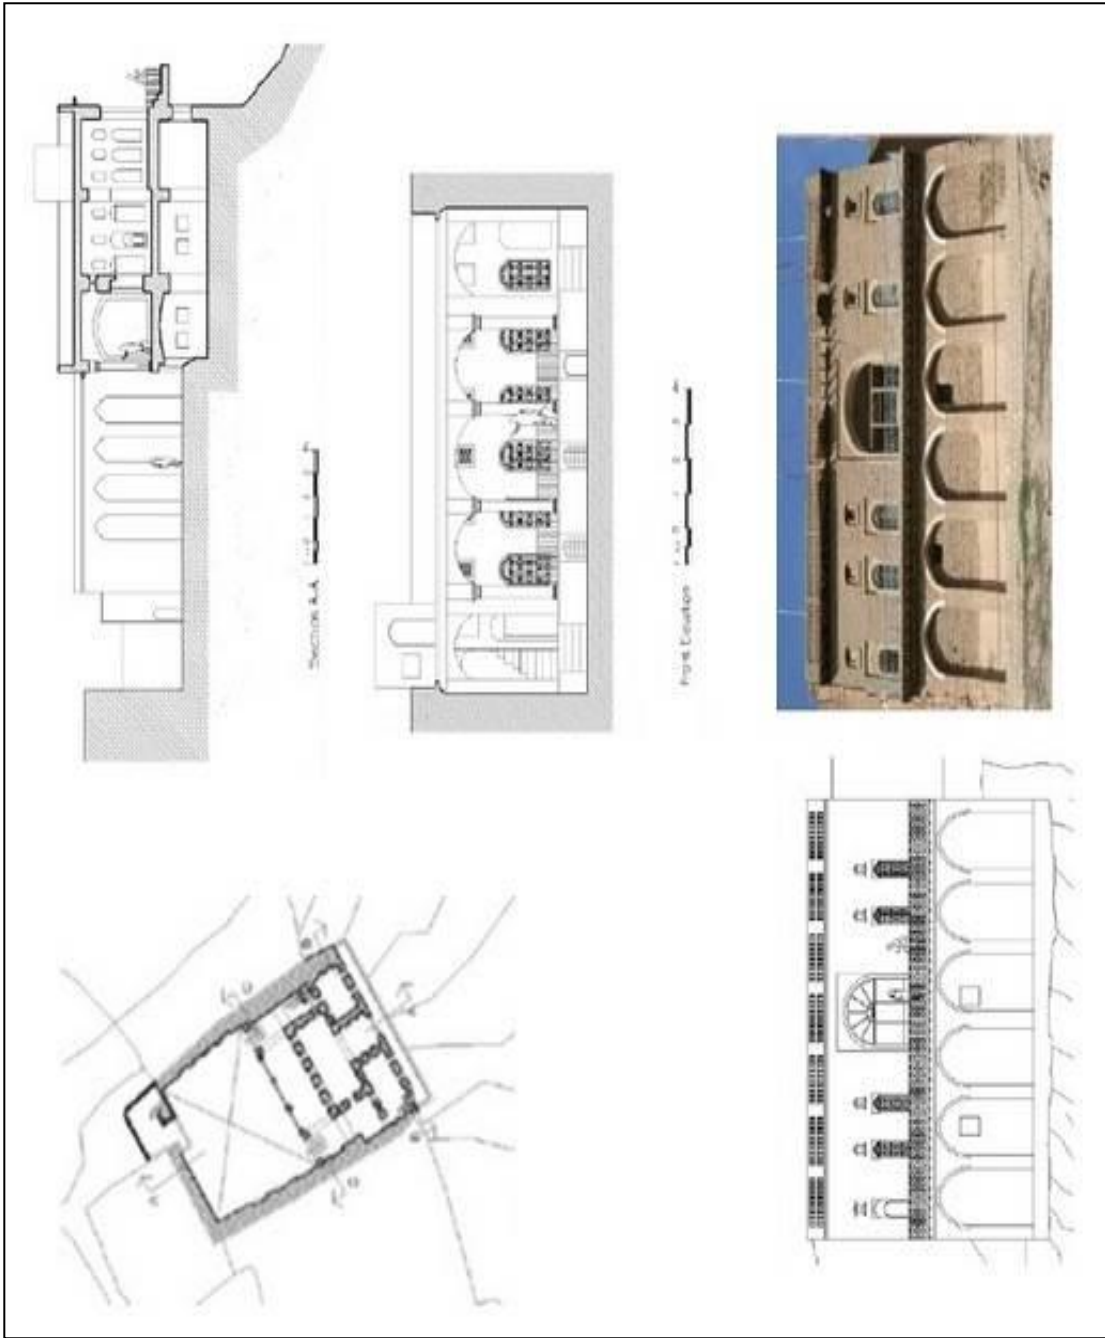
Rashid Agha, the Courtyard House- Plan and Section Inside Erbil Citadel. [104]
